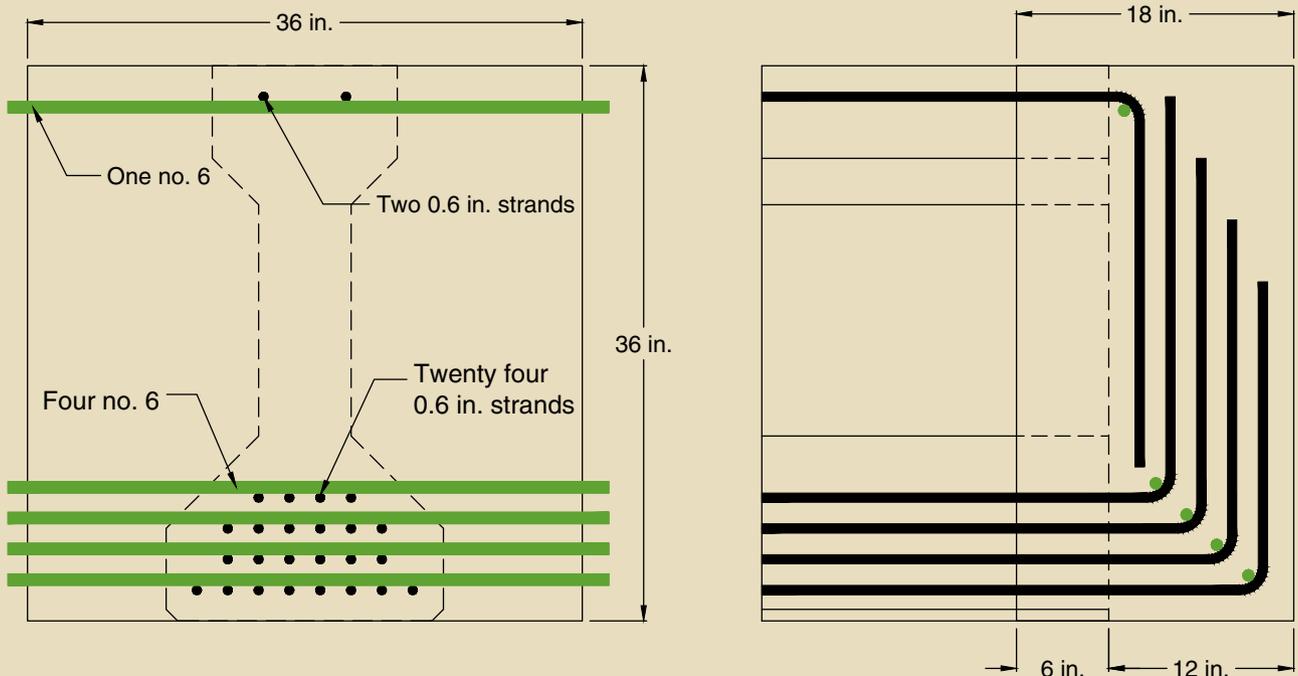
Dimensions and reinforcement details of end diaphragms. Note: 1 in. = 25.4 mm; No. 6 = 19M.
